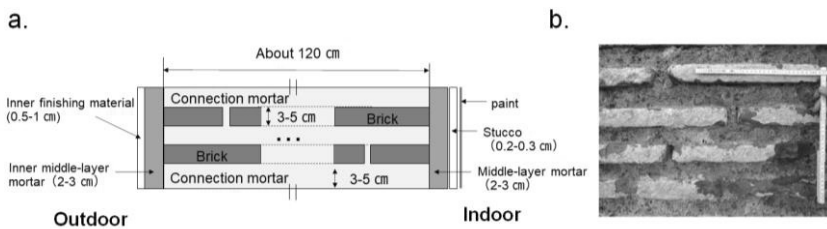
(a) Wall components in the exedra walls and (b) outer appearance of the wall in 2012
